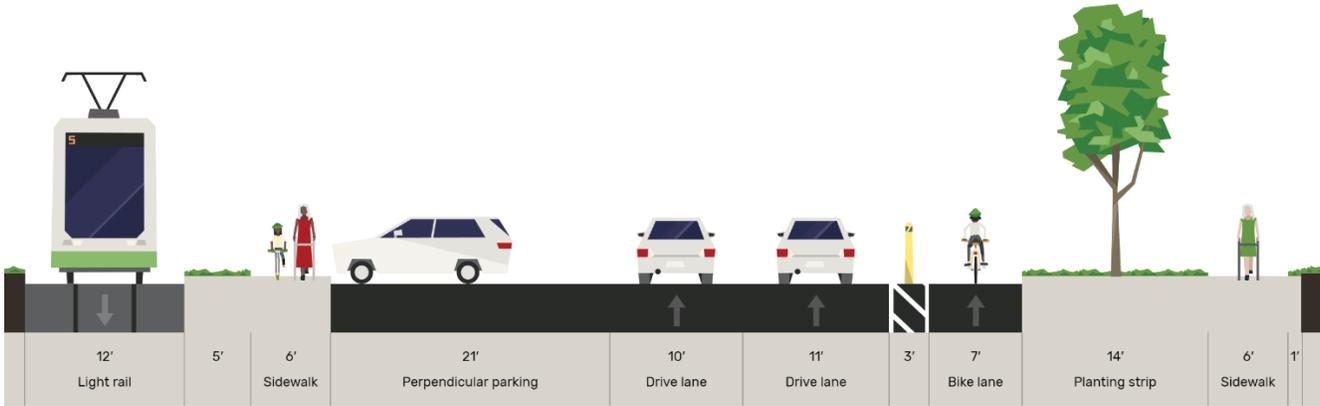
Proposed cross section for separated bike lanes from Farnsleigh Road to Parkland Drive/Lynnfield Road.
